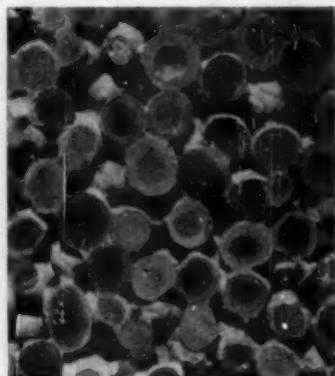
"No-fines" Concrete made with Pellets of Pulverized-fuel Ash.
